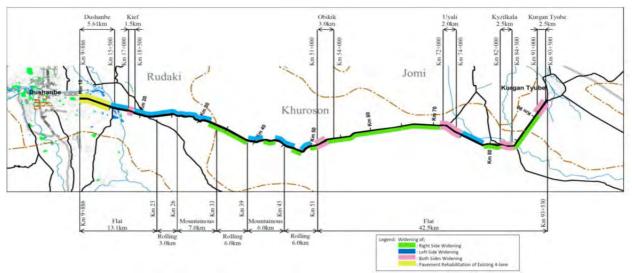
Widening to 4-Lane: Right Side, or Left Side or Both Side
